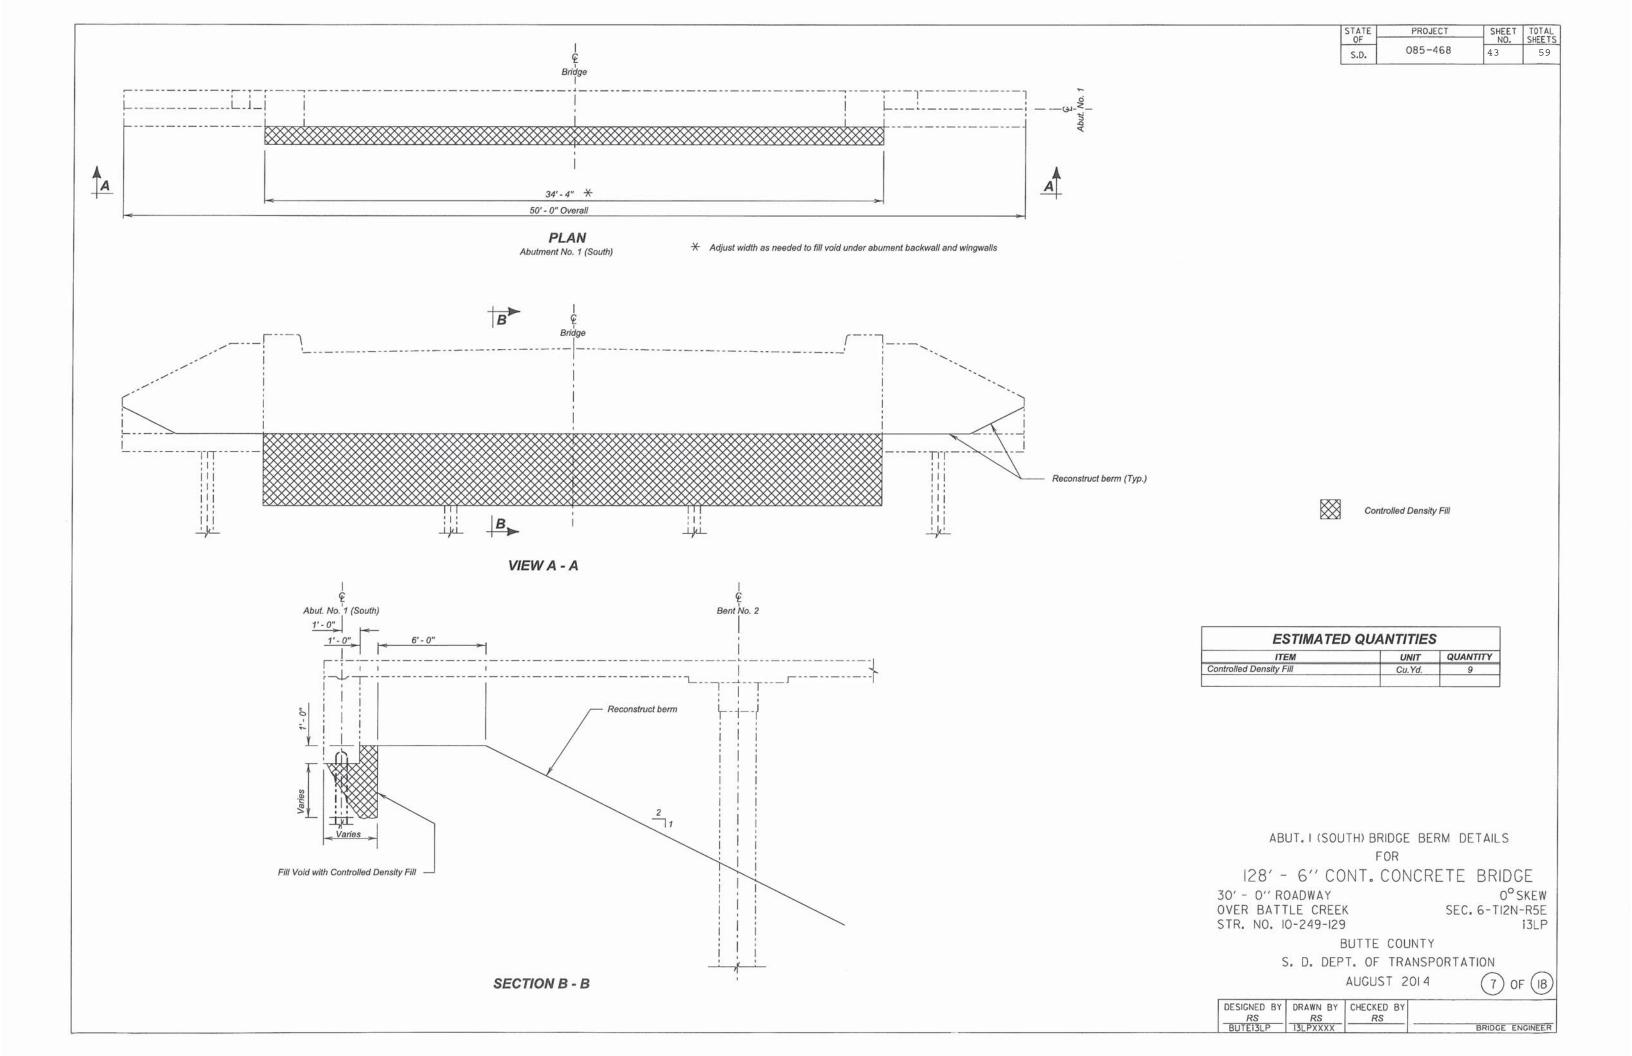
' – 6" CONTINUOUS CONCRETE BRIDGE
